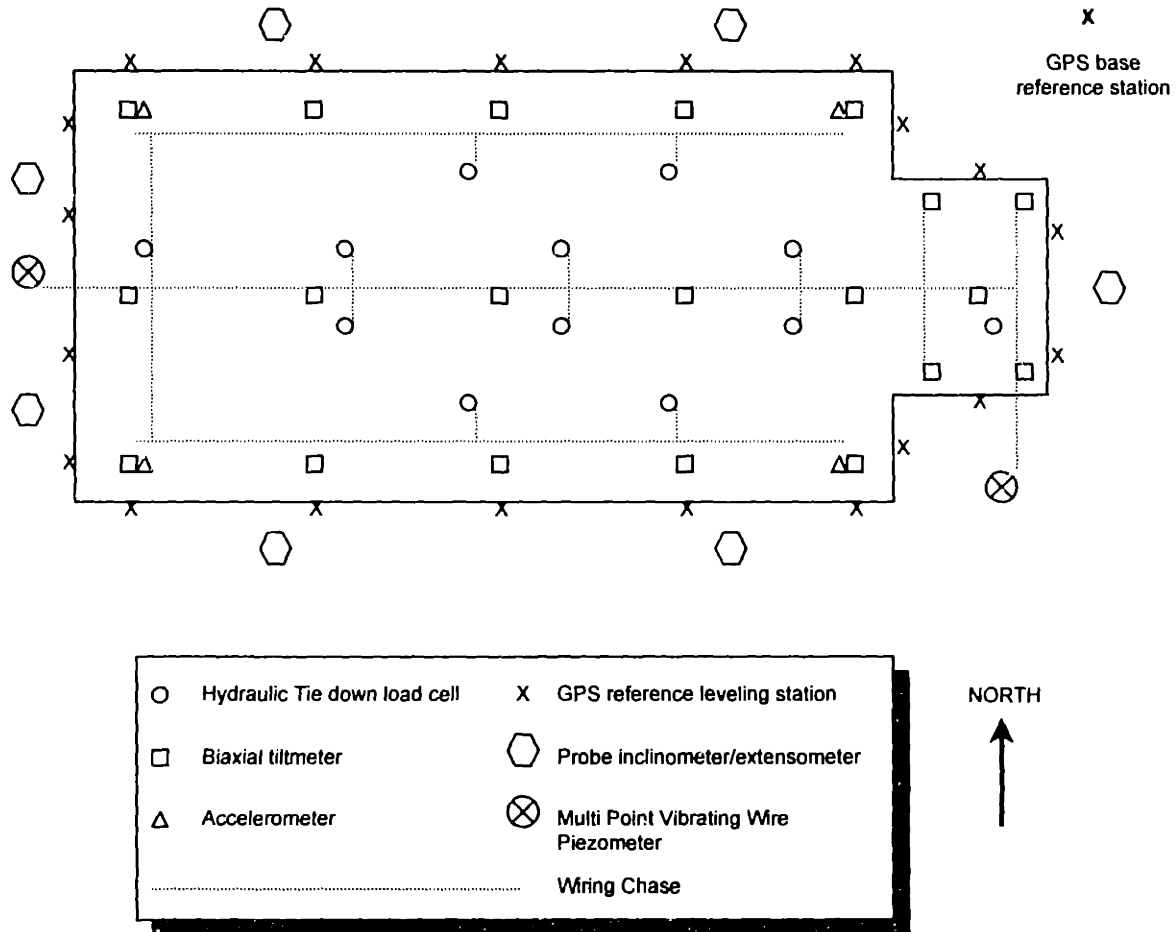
Proposed instrumentation layout for conceptual academic building.
